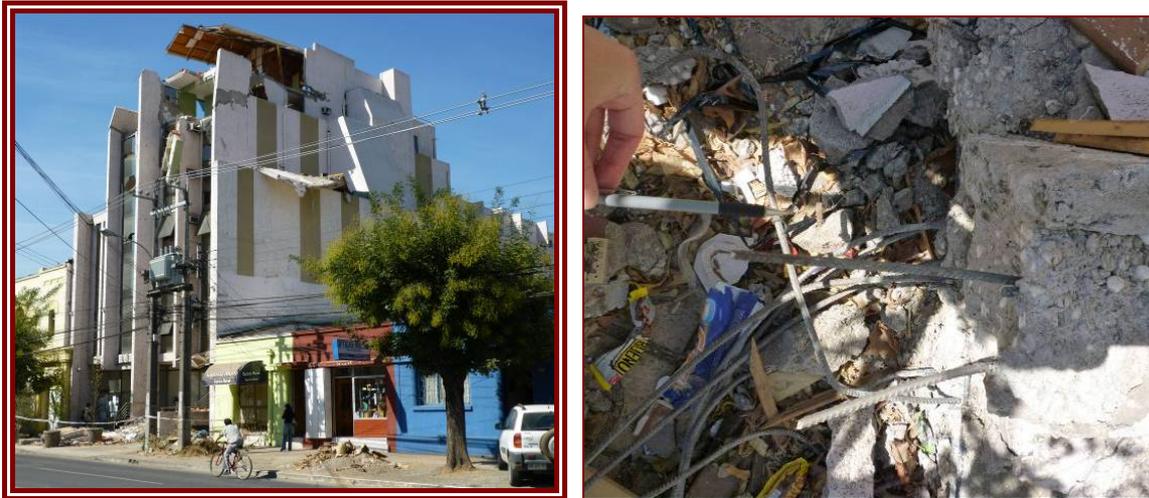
Edificio Aranjuez: out-of-plane failure of walls and reinforcement in rubble
